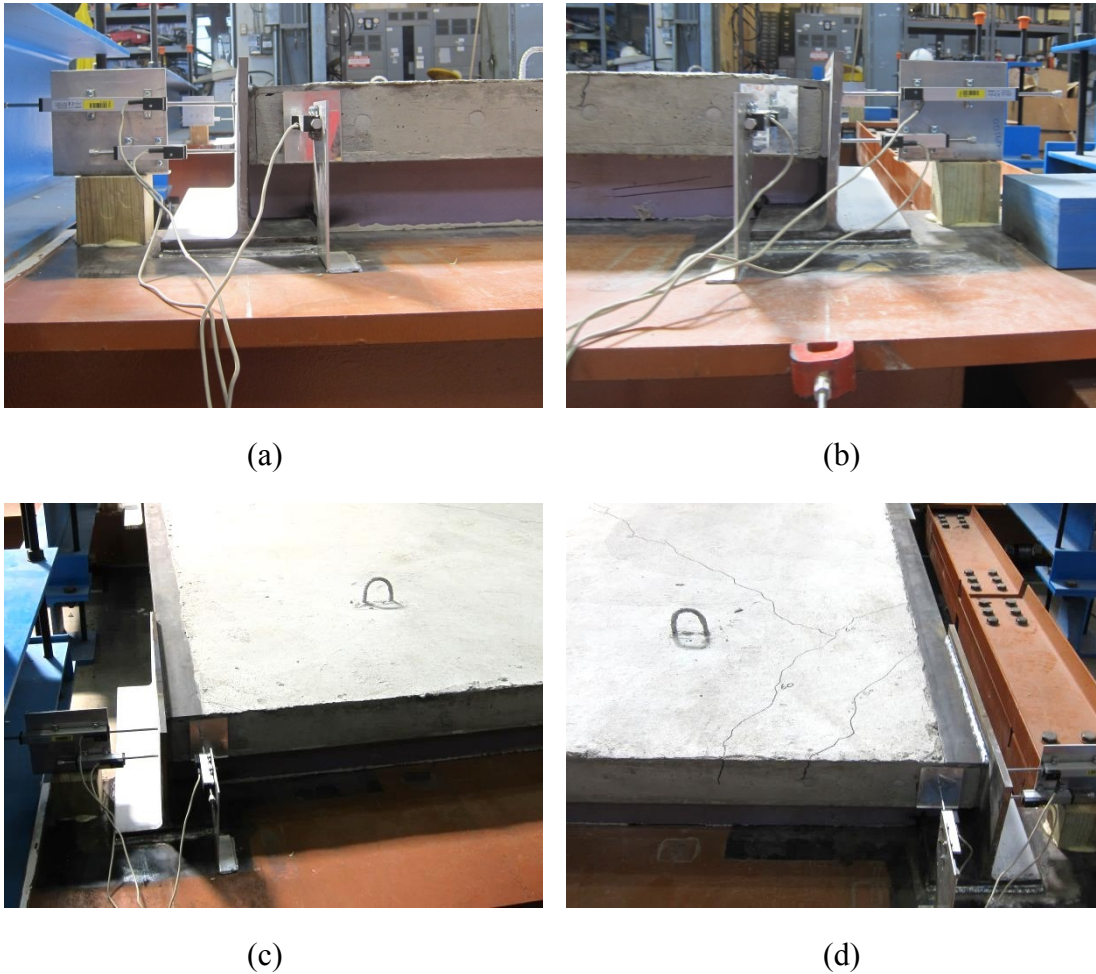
Elevation View at the South-East (a) and the South-West (b) Corners and Plan View at the South-East (c) and the South-West (d) Corners of Test 8 PCP at 0.6" of Panel Movement
